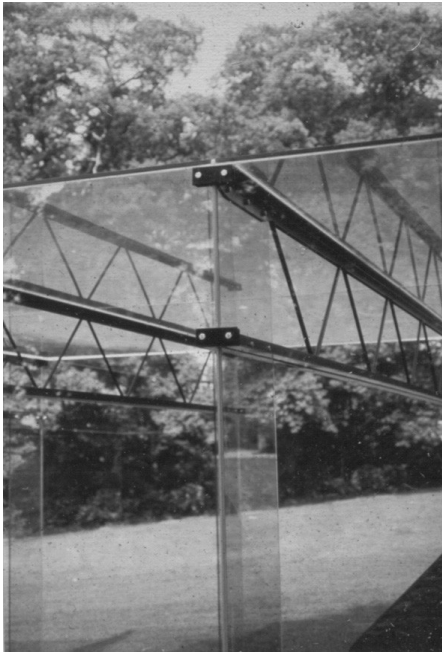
Sonsbeek Pavilion (detail of the joint between the glass column and the steel truss), architectural design by Benthem & Crouwel, glass design by Rob Nijssse and Michel Maarschalkerwaard (ABT), 1986, Arnhem, the Netherlands.
